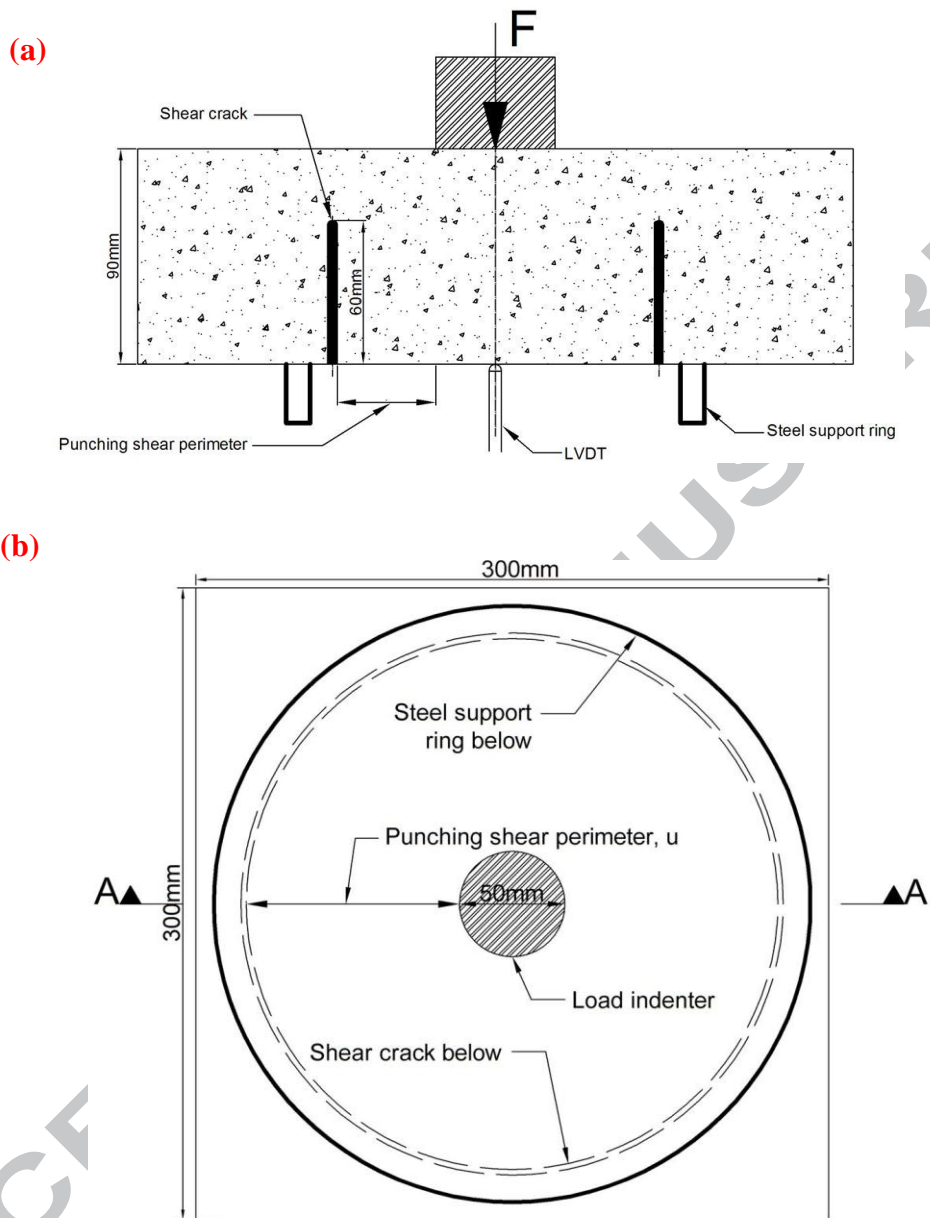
The final test setup: (a) Section view, and (b) Plan view.
